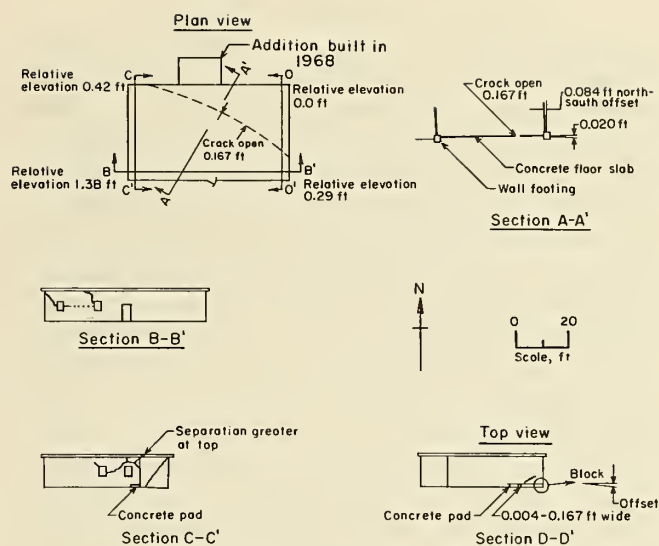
Plan of damage to radio station building. The damage is not inclusive. The relative elevations on the structure were surveyed on July 30, 1967.
